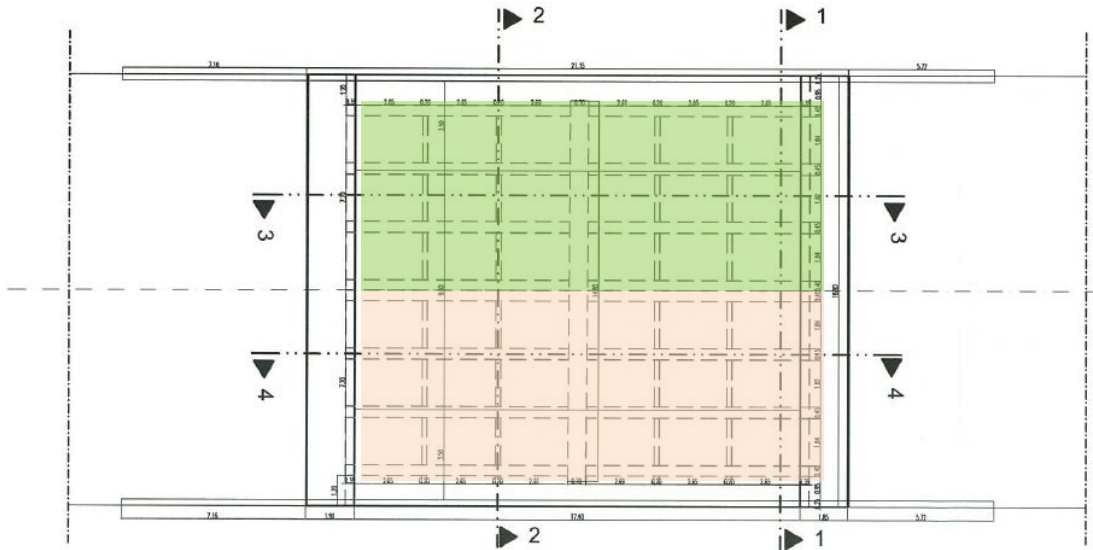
Position of deck slabs, longitudinal and transverse ceiling beams and position of characteristic cross sections
